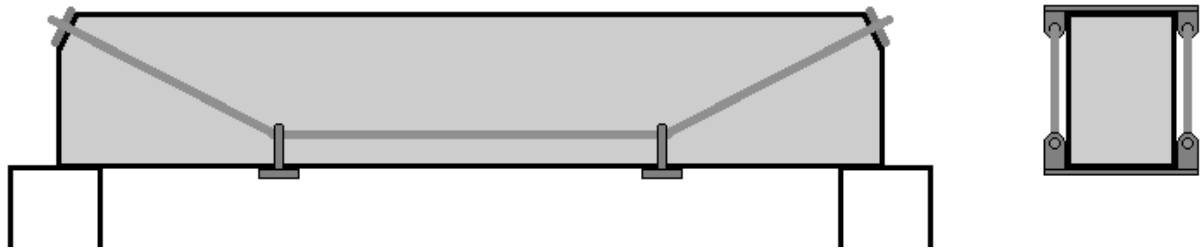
External prestressing of a simply supported beam, after Statens råd för byggnadsforskning (1978).
